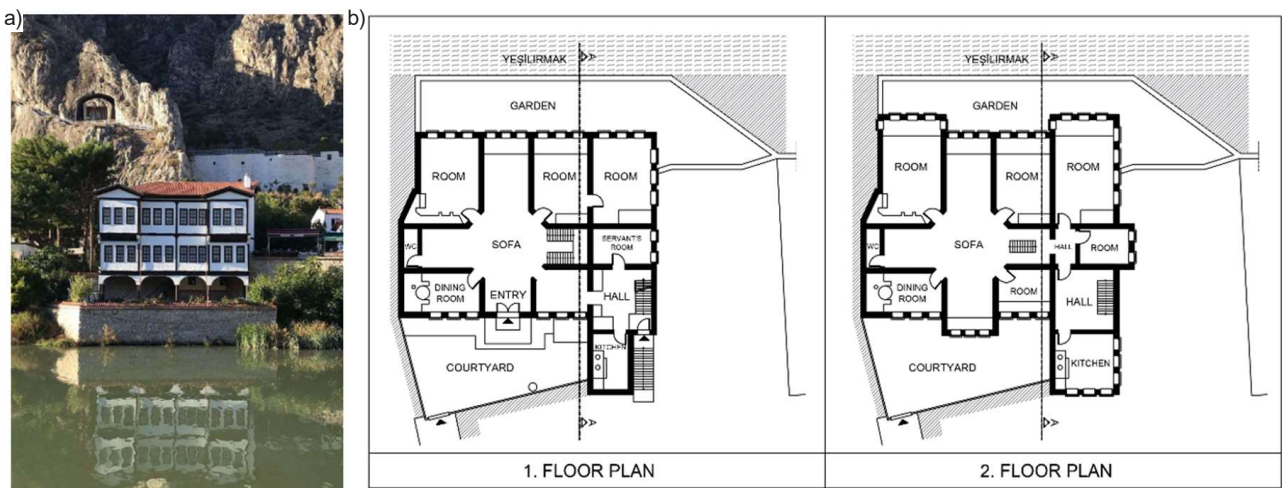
Studied building (a) (Author archive) and floor plans (b) (Ministry of Culture and Tourism, 2021) (Edited by authors)
